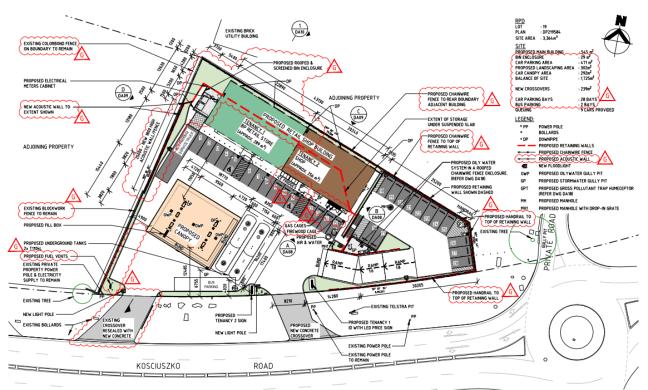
Proposed site layout plan (with amendments to original plan shown in red clouds), a full size set of plans are attached to this report.
